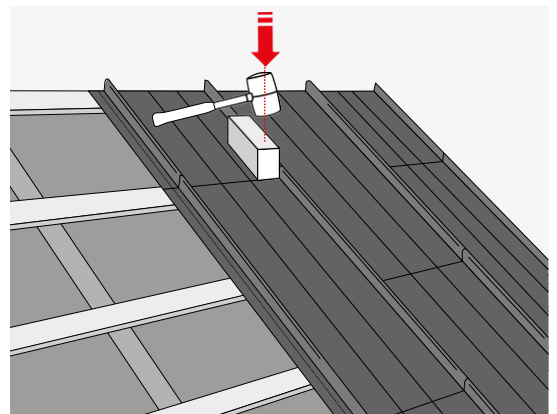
LAYOUT OF PANEL JOINTS ON THE ROOF
